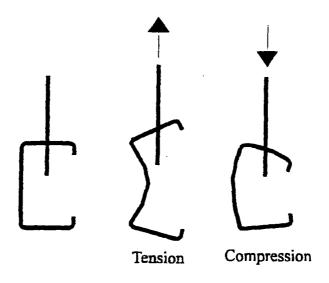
Typical Steel Stud Deformations for a One Flange Connection
